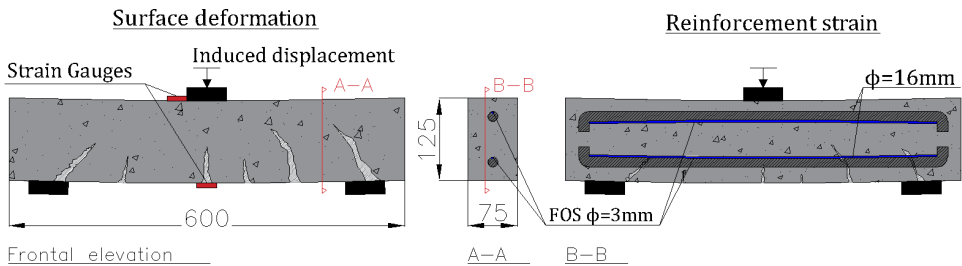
Test set up; frontal elevation (left), cross section (center) and longitudinal section (right).
